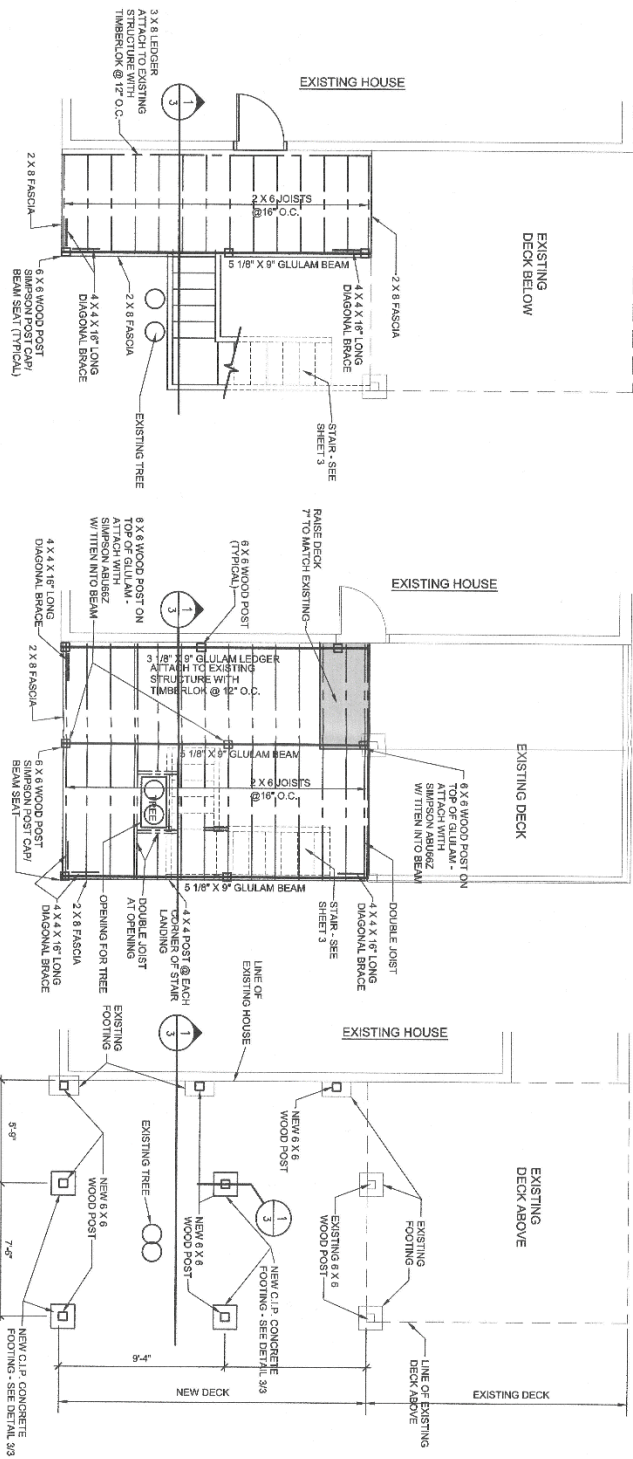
Detail view of page 1, floor plans, for the Mid-Level floor plan.
